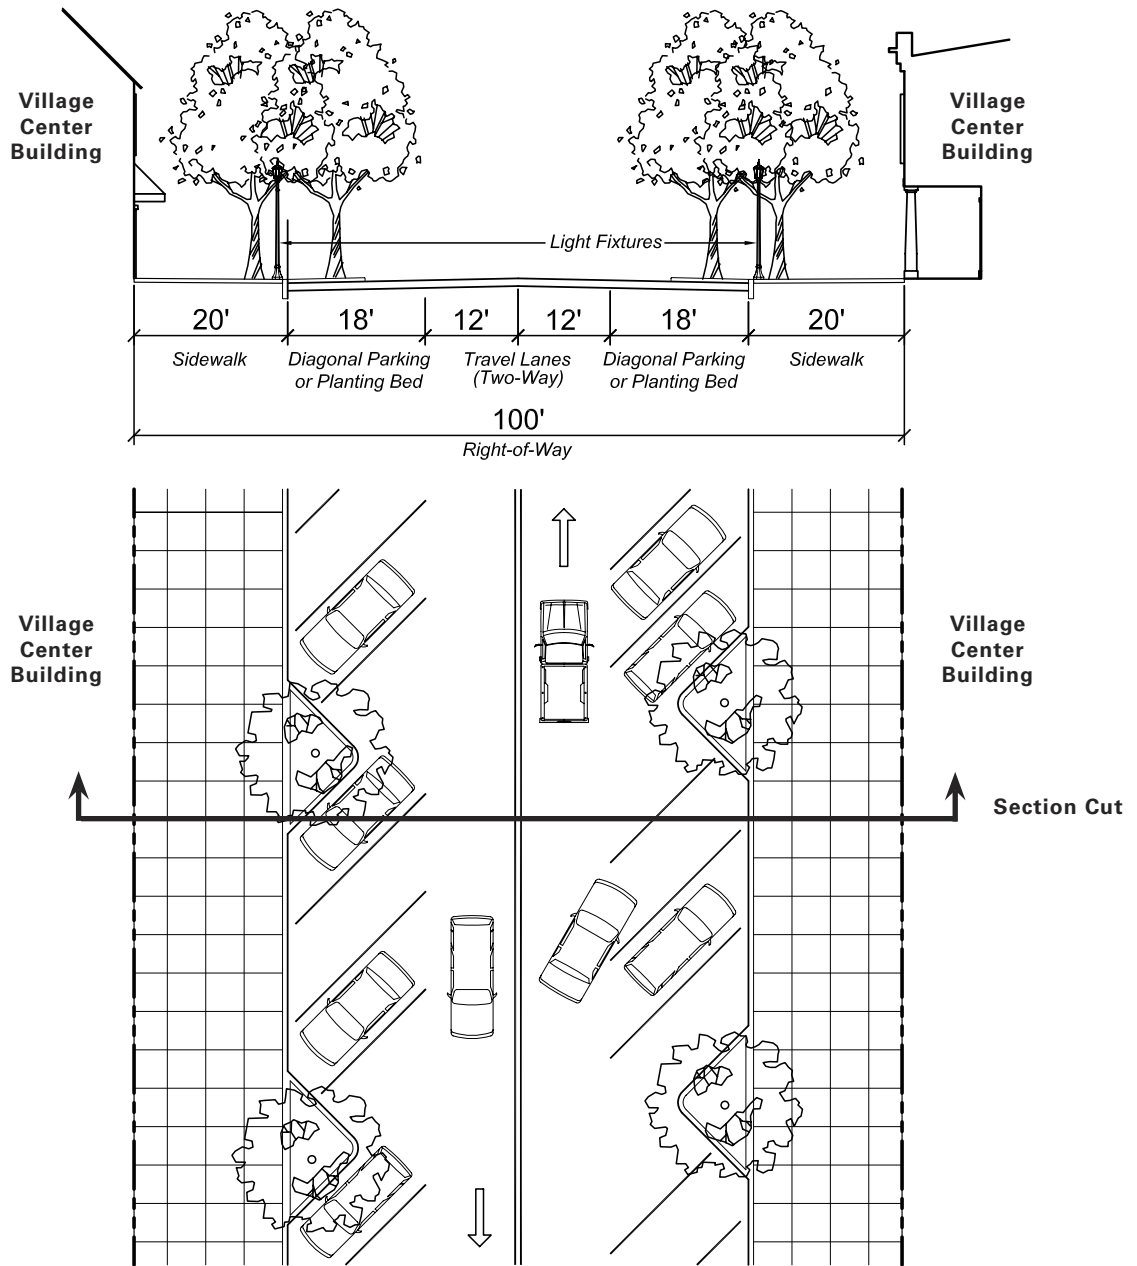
Proposed Section and Plan: Village Center Street A (Alternate)
